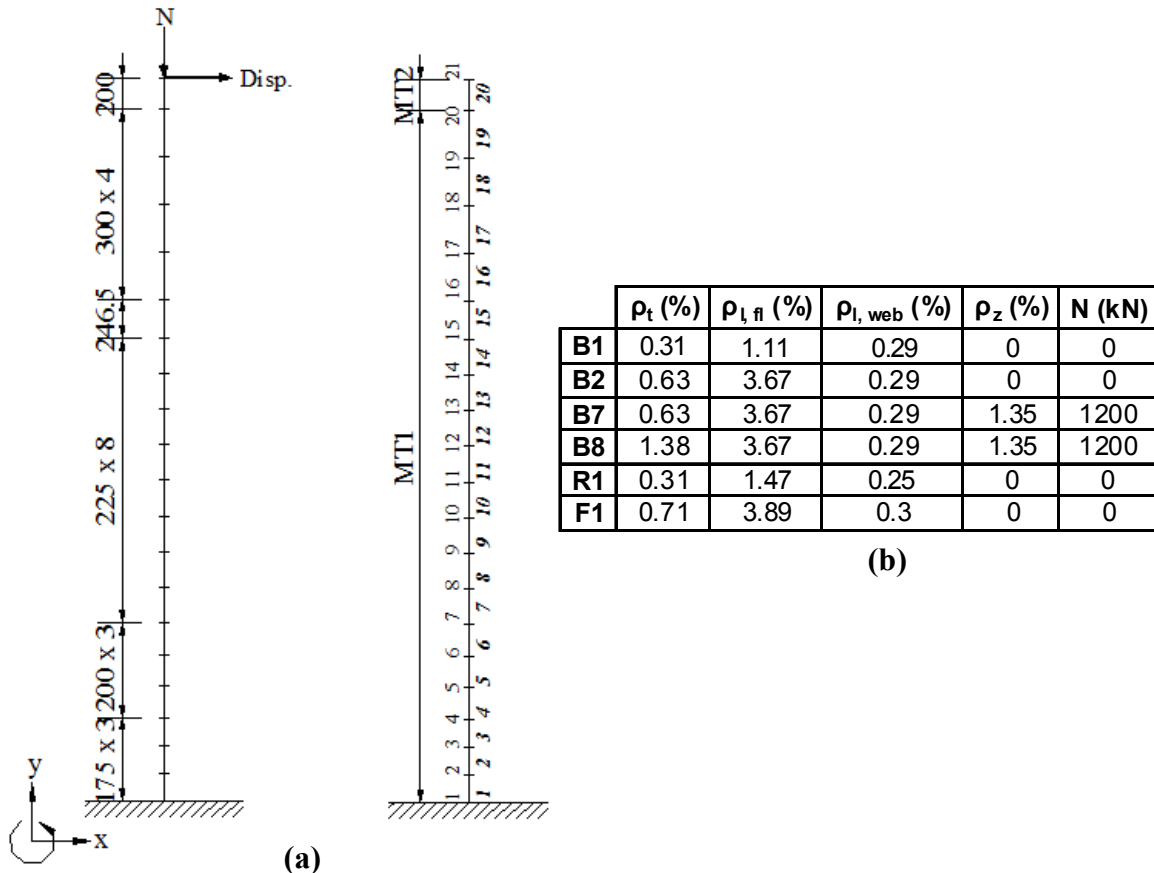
Modelling of PCA Walls: (a) Frame Model; (b) Reinforcement Ratios
